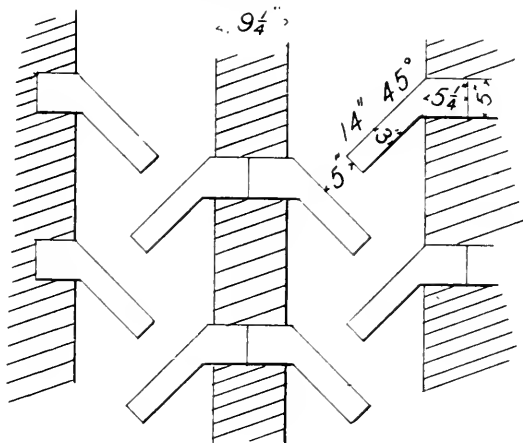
Tiling of Furnace No. 3, New Almaden.
